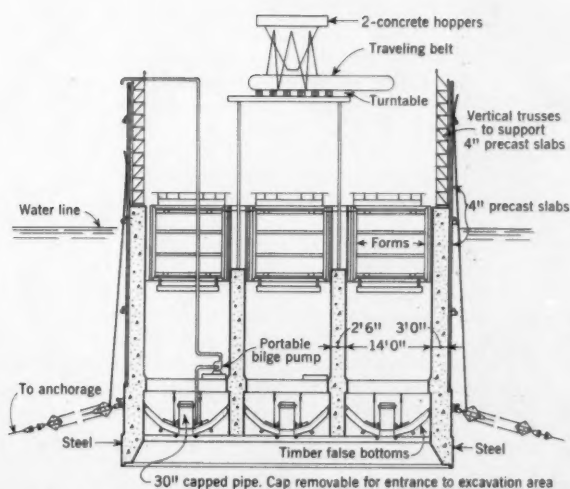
Steel cutting edge of 18-cell cofferdam was assembled in drydock of shipyard in San Francisco, then concreted to height of about 31 ft, then floated and towed to site, and positioned with anchors. Photo at left above shows steel base of caisson in drydock, with cutting edge in place. Photo at right above, and drawing, show caisson as it was towed to site. Note lightweight vertical trusses supporting 4-in. precast concrete slabs used for external forms. Concrete hoppers and belt conveyors were added after caisson was in position.
